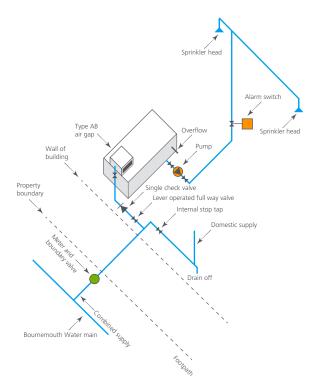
Storage and Boosted Sprinkler Supply via a Single Metered Connection
